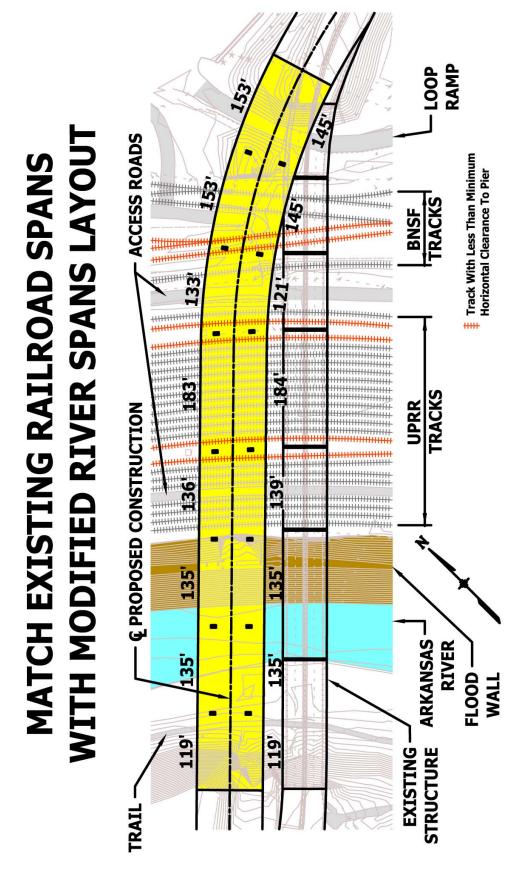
Match Existing RR Spans w/ Modified River Spans - Plan
